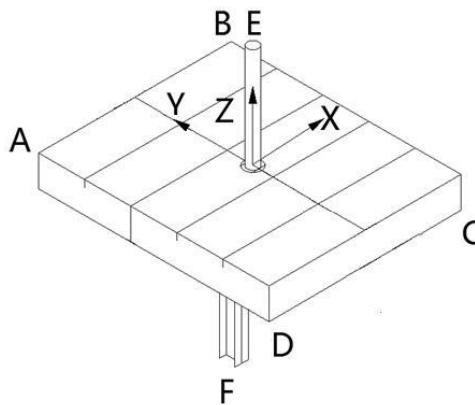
Boundary of the connection details between misaligned pillars
